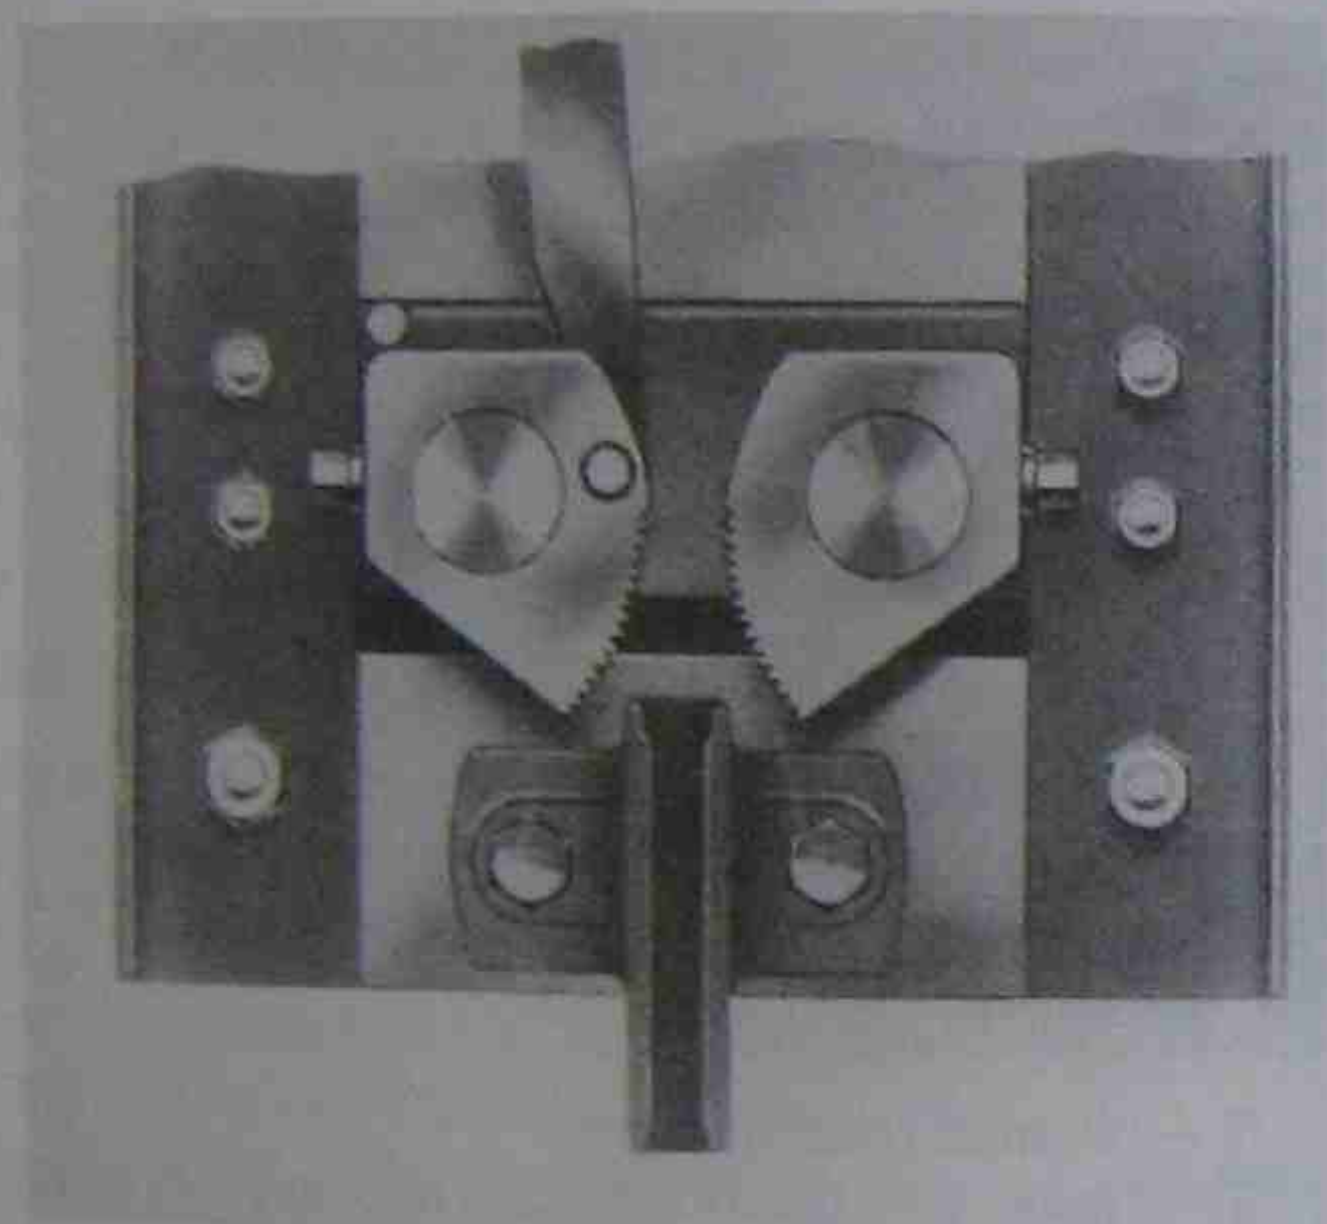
Instantaneous safety gear of eccentric cam type (Express Lift Co.).
